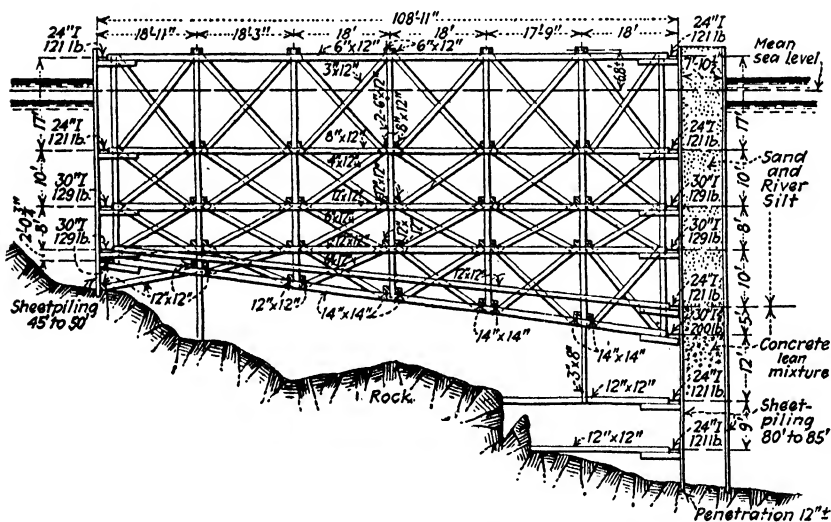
Longitudinal Section of North Cofferdam.
